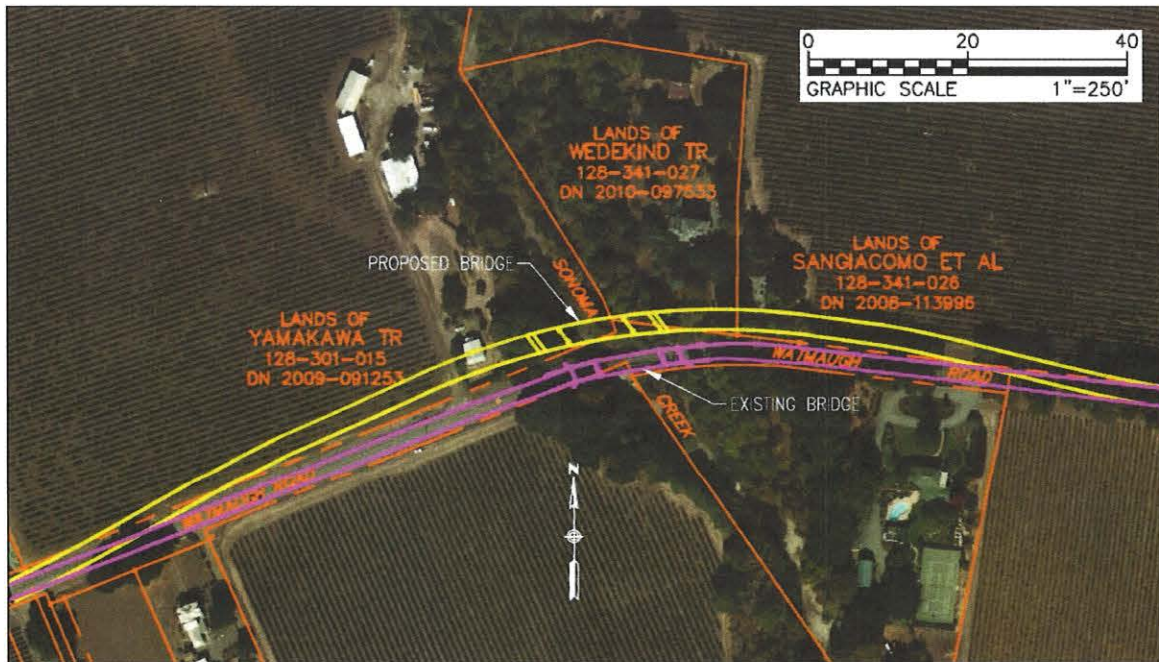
Aerial showing alignment for Alternative 8, construct a new bridge upstream, June 2018
